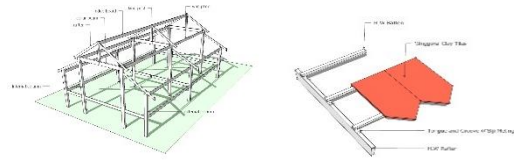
The main roof structure of the 'Rumah Tiang Dua Belas'.
